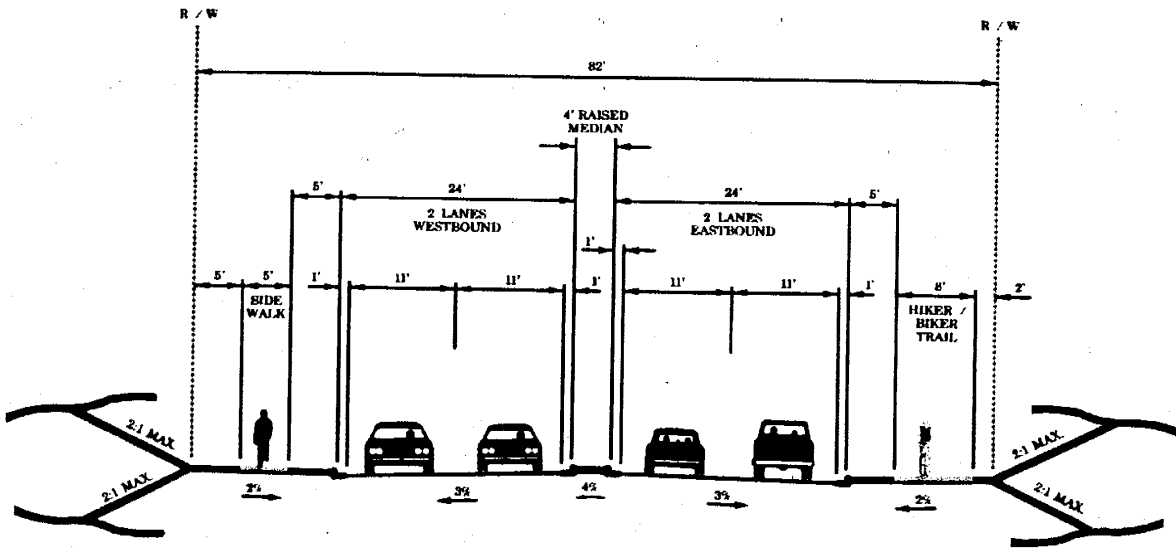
Figure II-G: Typical Section from just West of Rock Creek Park to Veirs Mill Road
